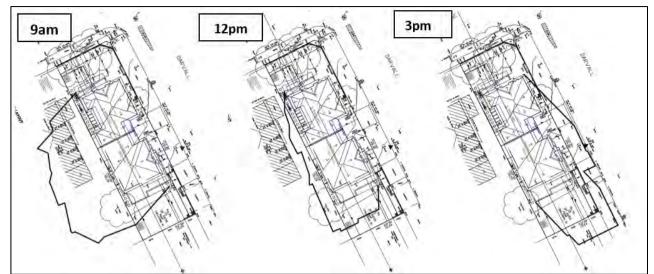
Proposed shadow diagram showing proposed dual occupancy does not overshadow the neighbouring dwelling between 12pm and 3pm
